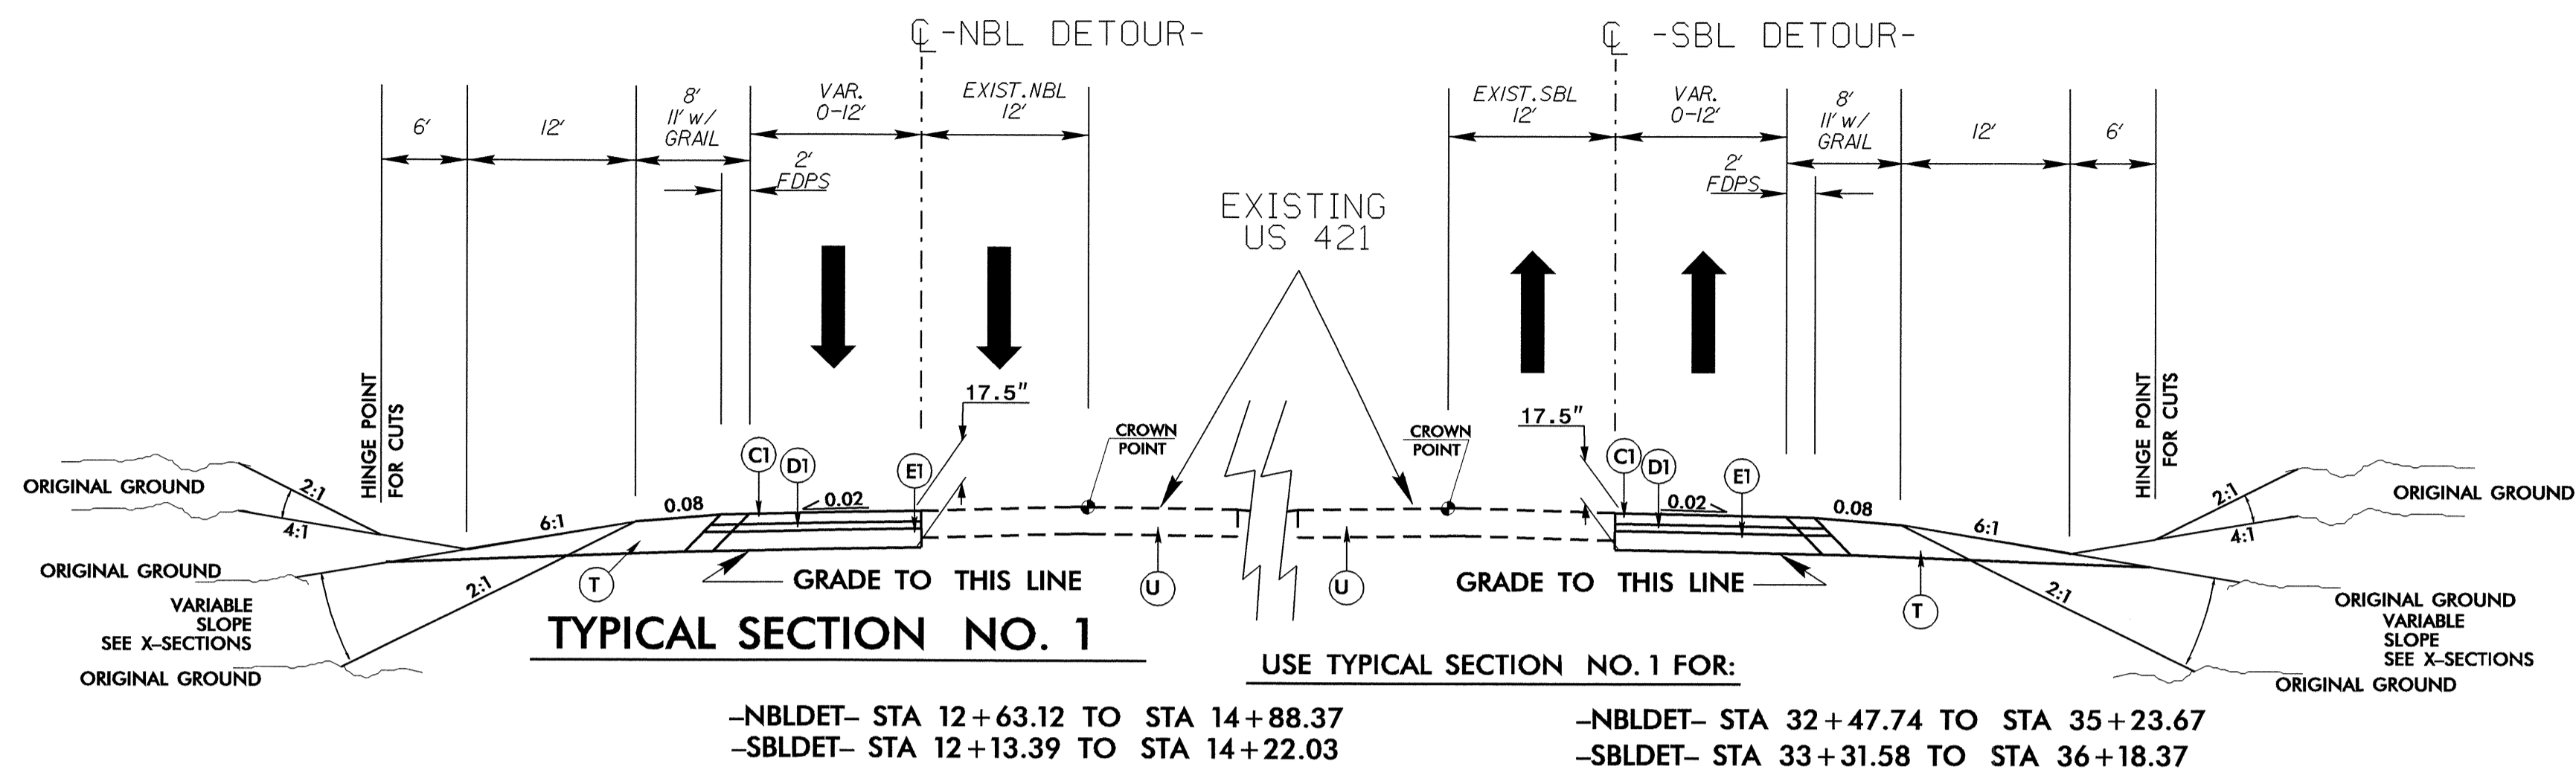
DETAIL SHOWING LIMITS OF PAVEMENT DESIGN, See Typical Sections
